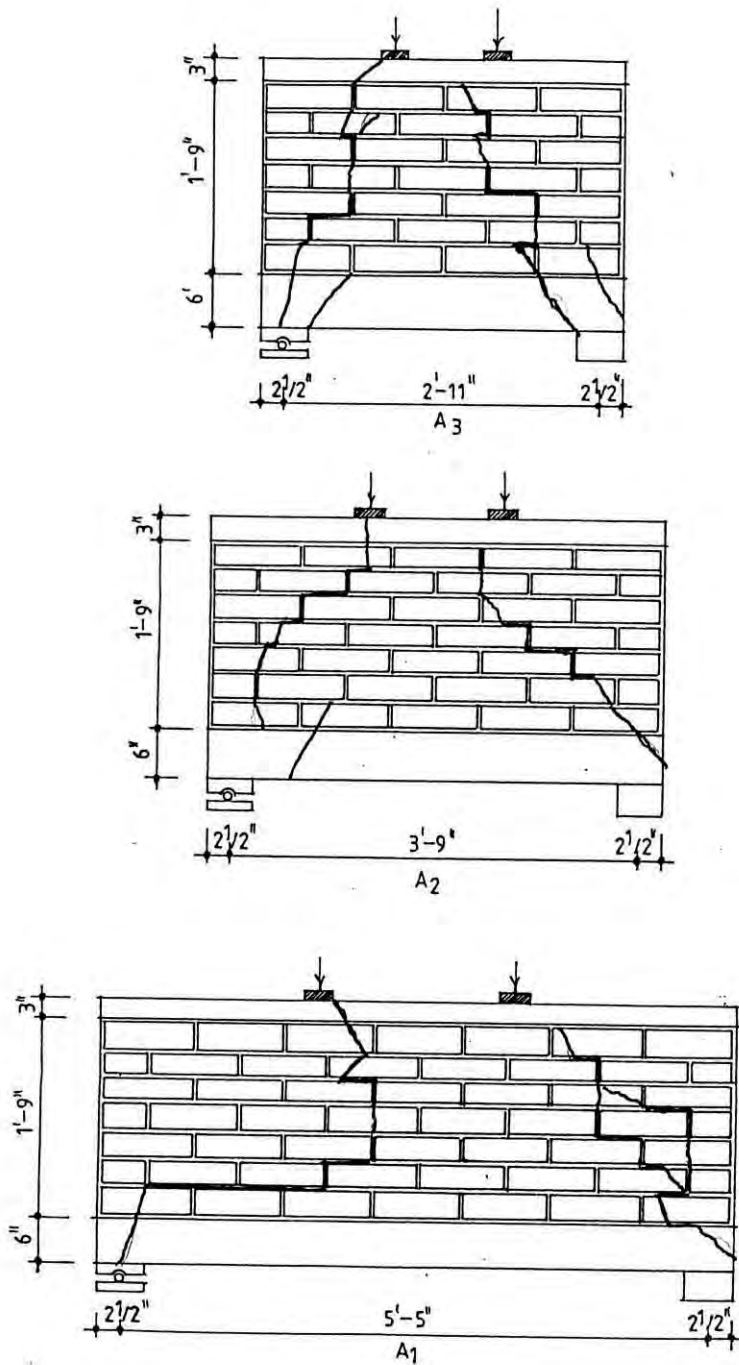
Crack Pattern of Running Bonded Composite Wall-Beam Group A
